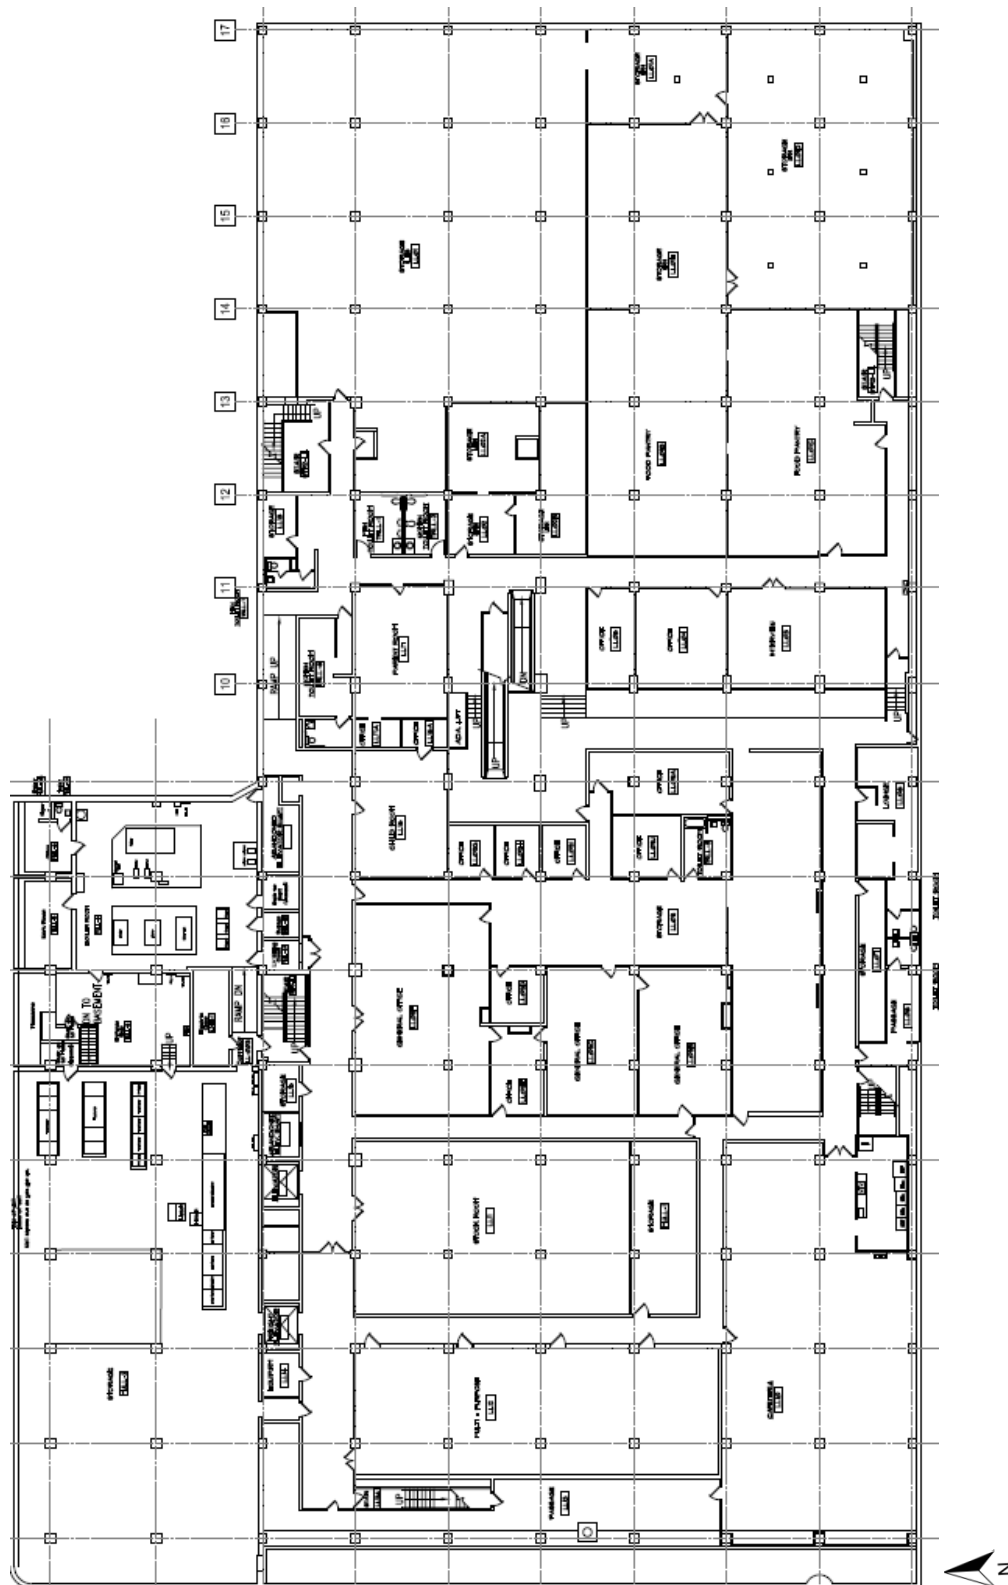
Current Basement Floor Plan (Quorum Architects). Not to Scale.
